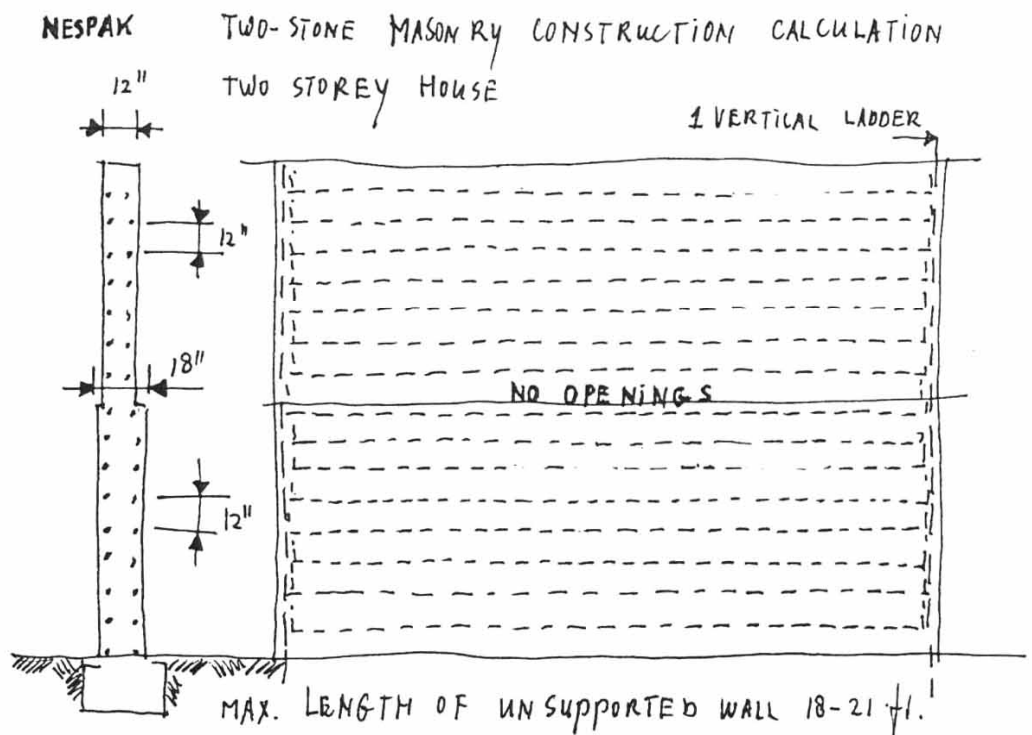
RECOMMENDED PLACEMENT OF BACIP WIRE-MESH REINFORCEMENT IN WALLS
